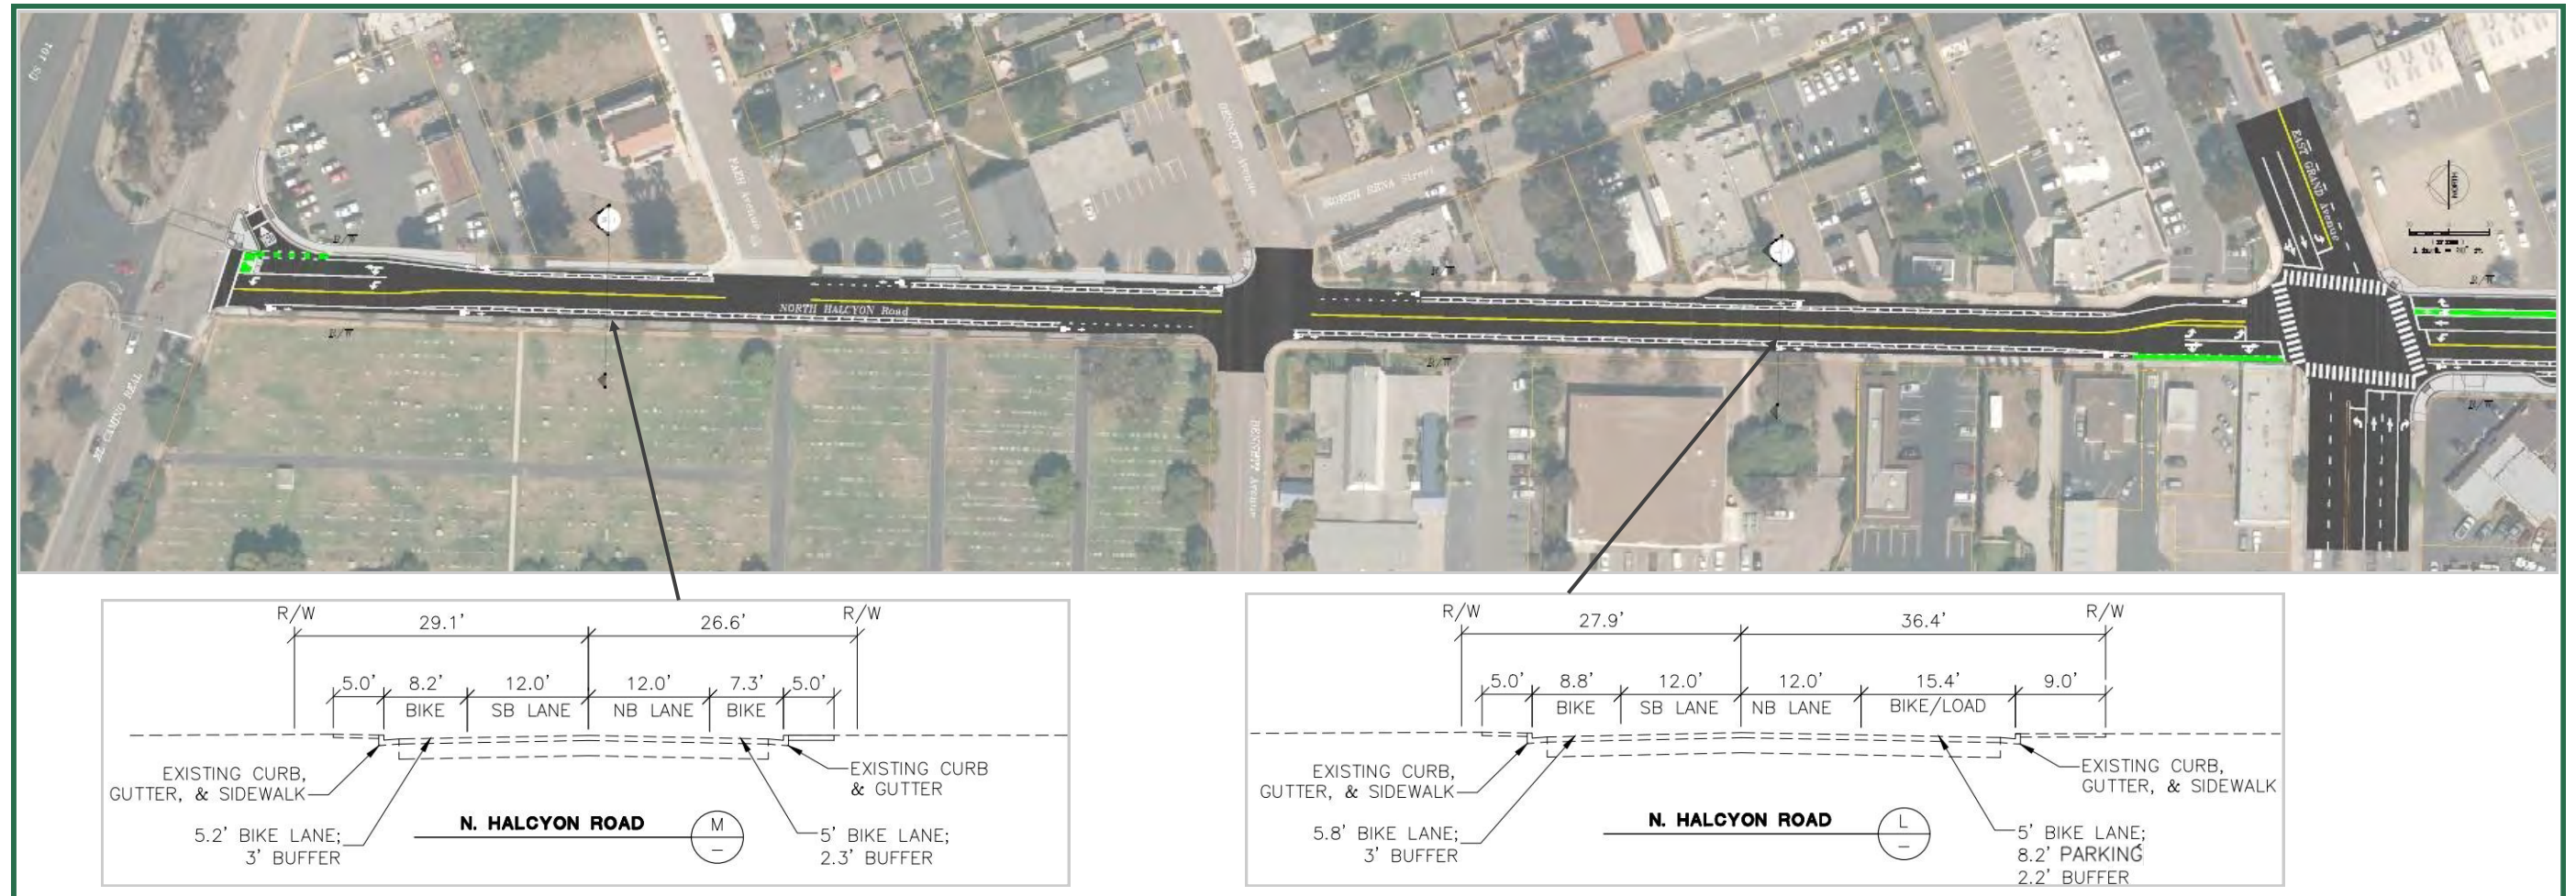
Recommended Context Zone 1: Sections 1—3 Plan
